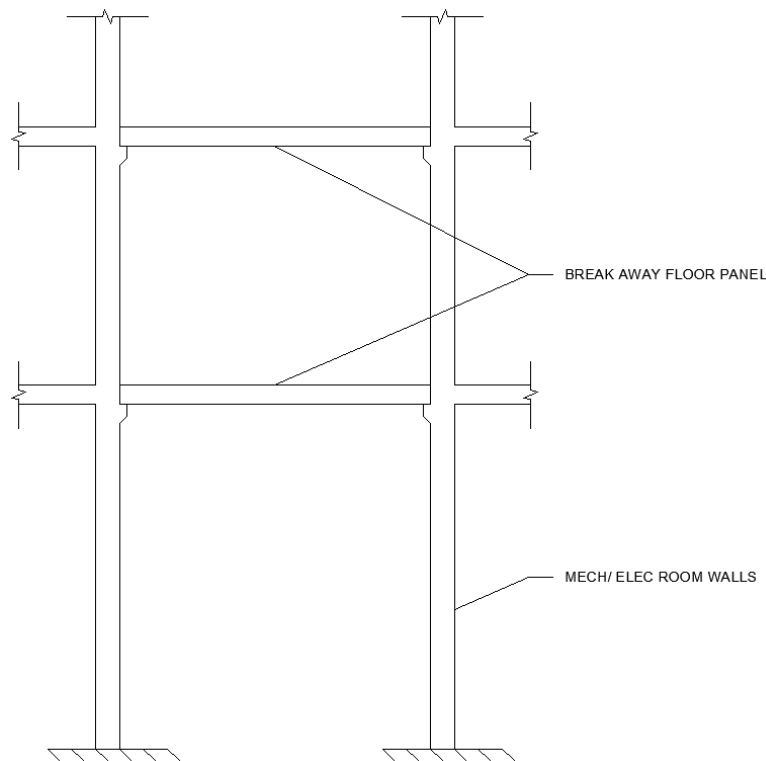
Mechanical/Electrical room break-away floor panels applied to all levels up to h_{\max}
